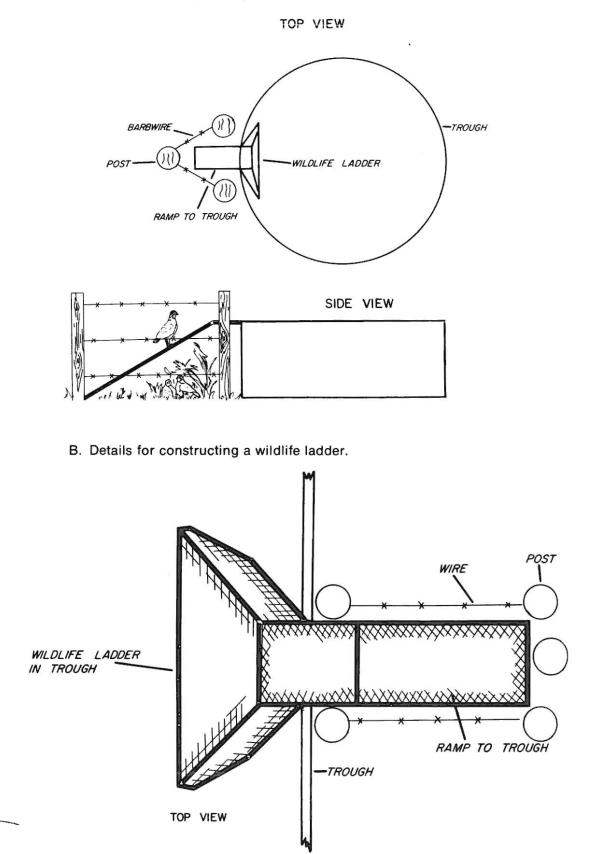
Plans for modifying a livestock water trough by providing both an outside and inside wildlife ladder (Wilson and Hannans 1977).
